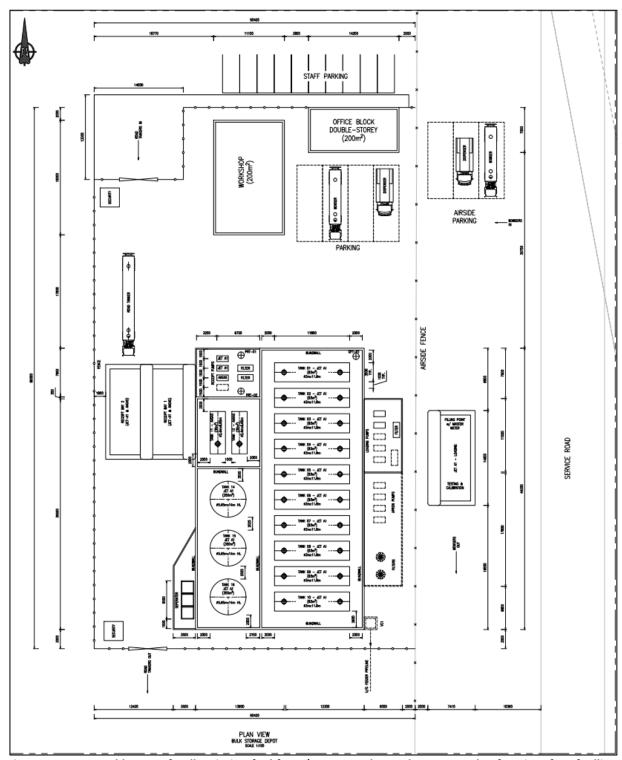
Proposed layout of Bulk aviation fuel farm (Kantey and Templar, Masterplan for Aircraft Refuelling Facilities; May 2023)
